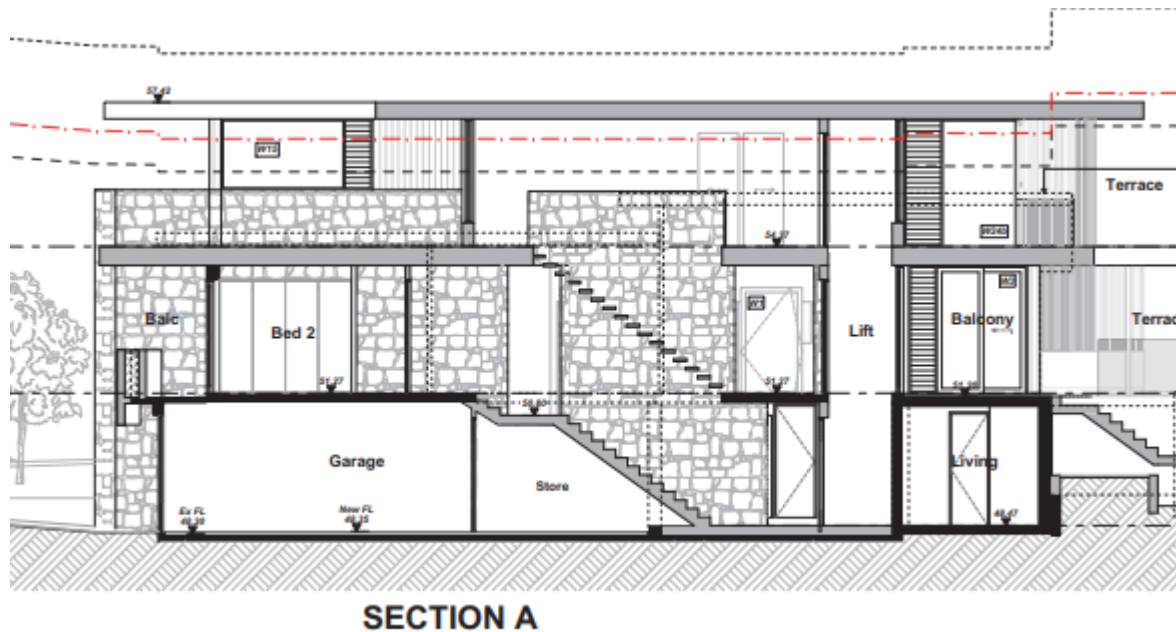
Plan extract showing 2 single flights of stairs within the proposed building
